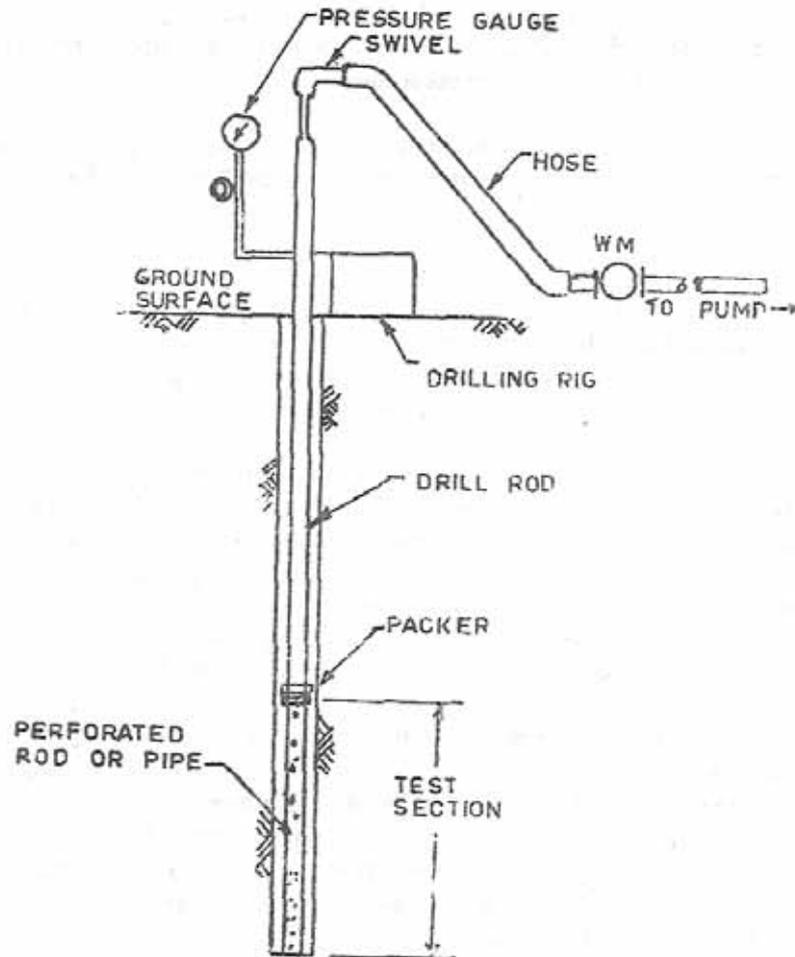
SKETCH SHOWING LAYOUT OF EQUIPMENT FOR PERMEABILITY TEST IN DRILL HOLE (SINGLE PACKER METHOD)
